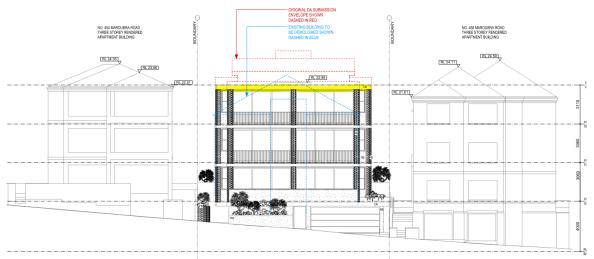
Southern street elevation of the proposed development and highlighted roof parapet
